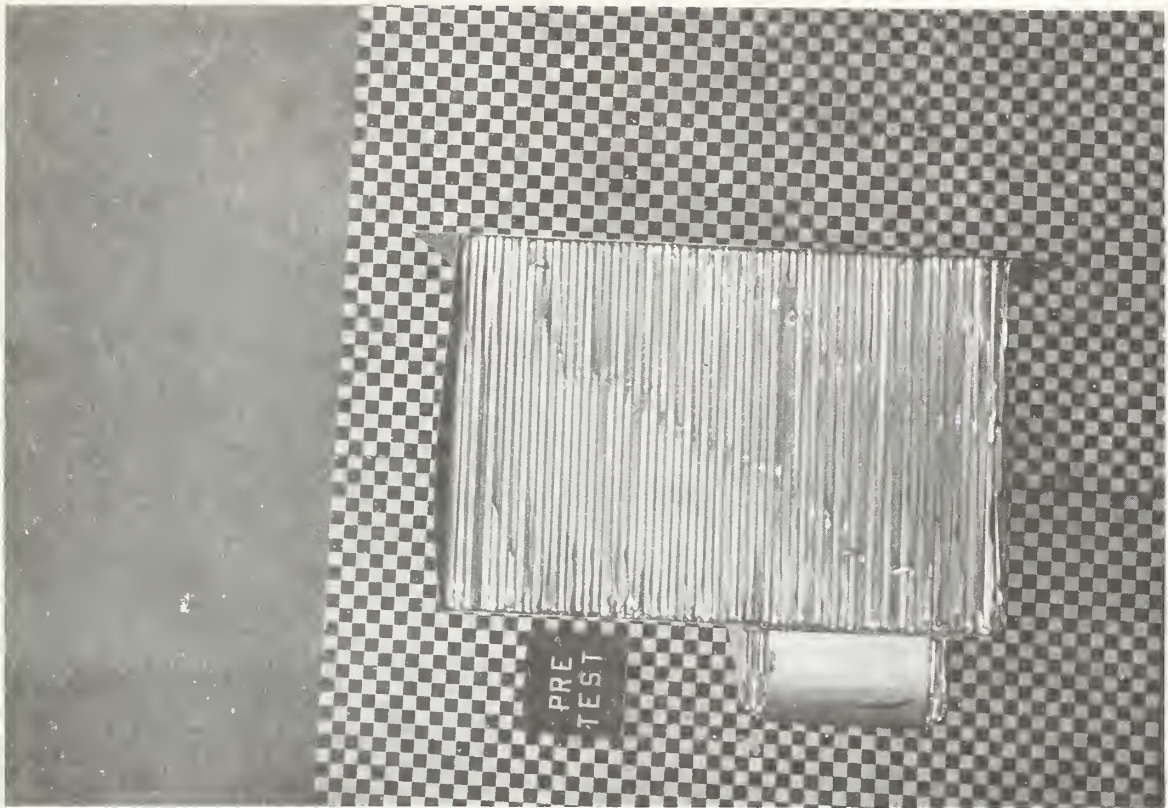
PRE-TEST MDB FACE - VIEW 2
